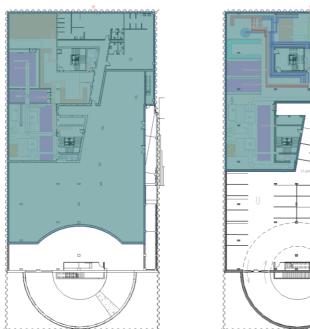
Plan view of level -1 and -2, where the heated area is highlighted with green.
